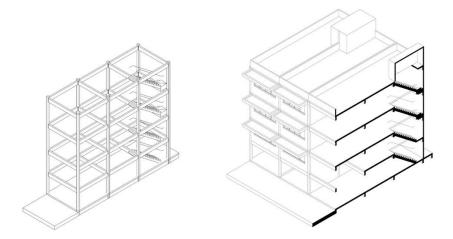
Shophouse skeleton structure (left), shophouse sectional cut (right)
